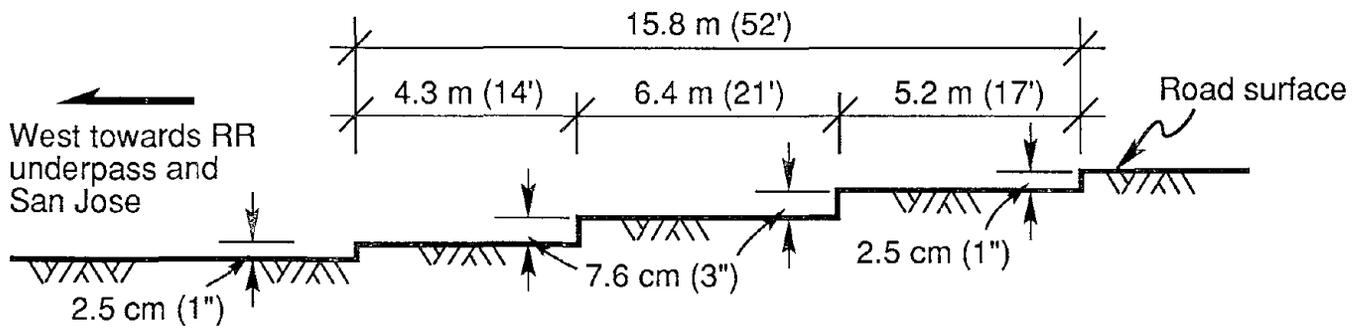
Elevation View of 20 cm (8 inch) Vertical Settlement over 16 m (52 feet) of Road Surface near Pueblo Nuevo Entrance.
